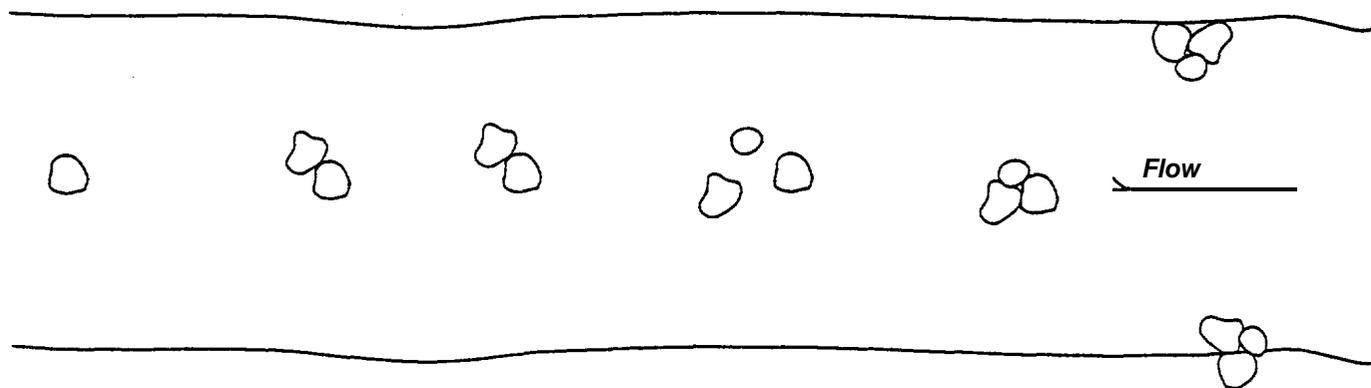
Plan view of turning rock clusters used in the Potters Pond enhancement project.
